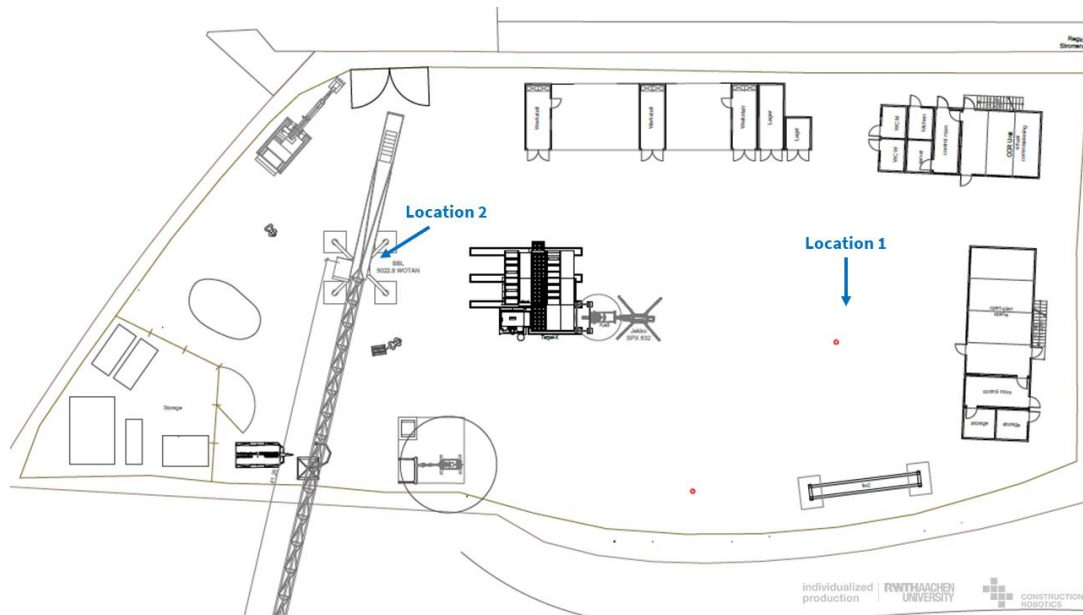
Site plan of the Reference Construction Site with both antenna locations marked
